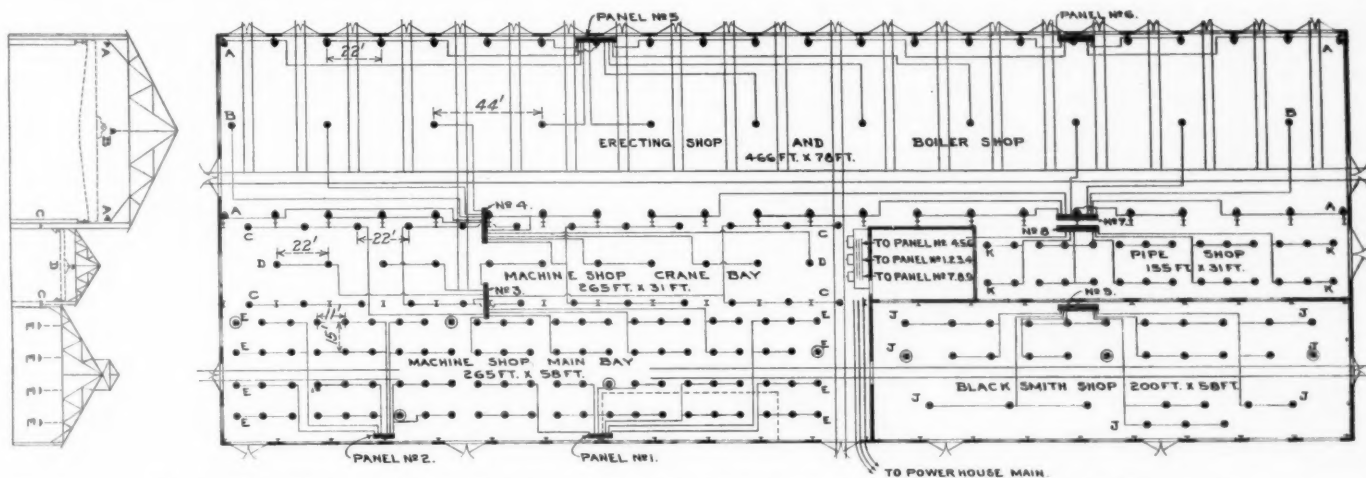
Floor Plan and Wiring Diagram of the Main Shop of the C., N. O. & T. P. Shops at Ferguson, Ky.
